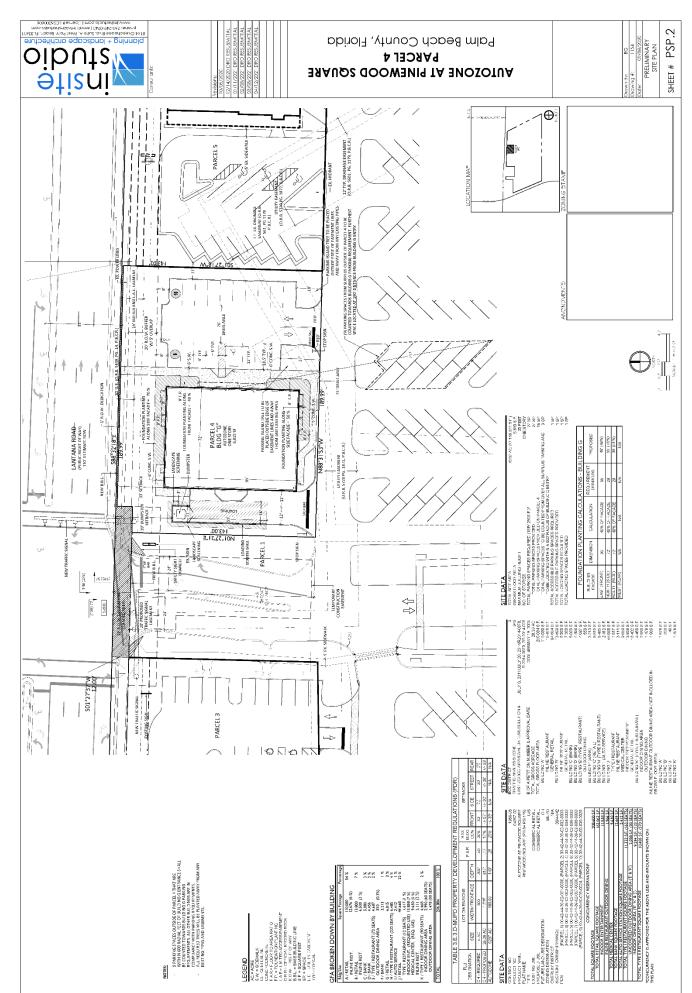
Preliminary Site Plan (PSP-2 of 2) dated April 26, 2021
